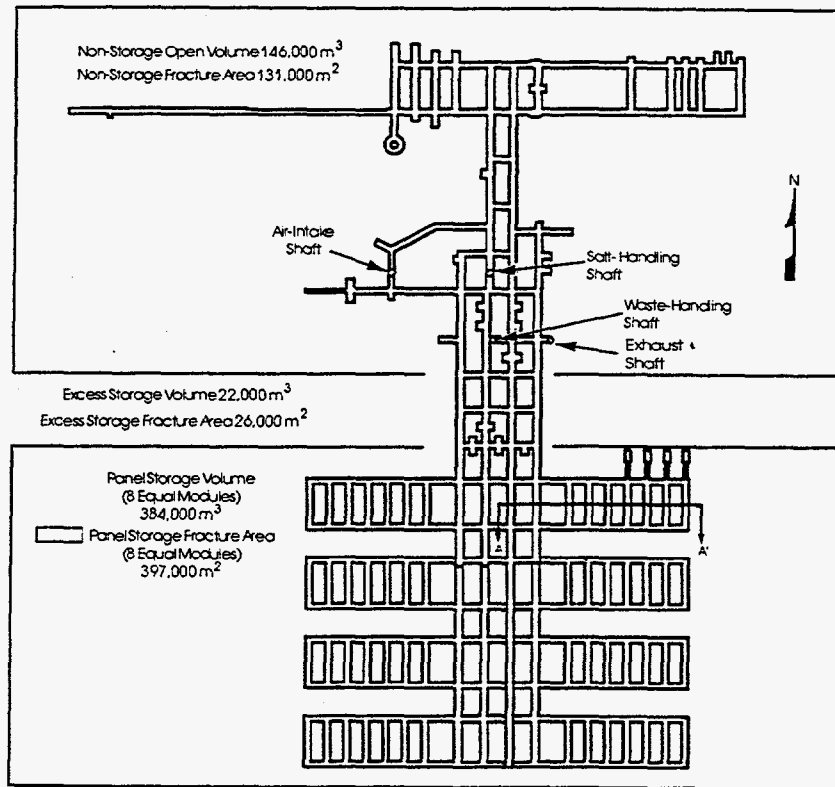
Plan View of the Proposed Underground WIPP Facility.
